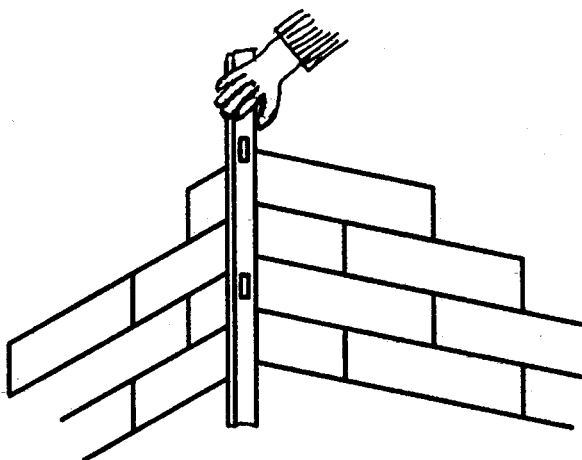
LEVELLING AND PLUMBING FIRST COURSE OF BLOCKS FOR A WALL
